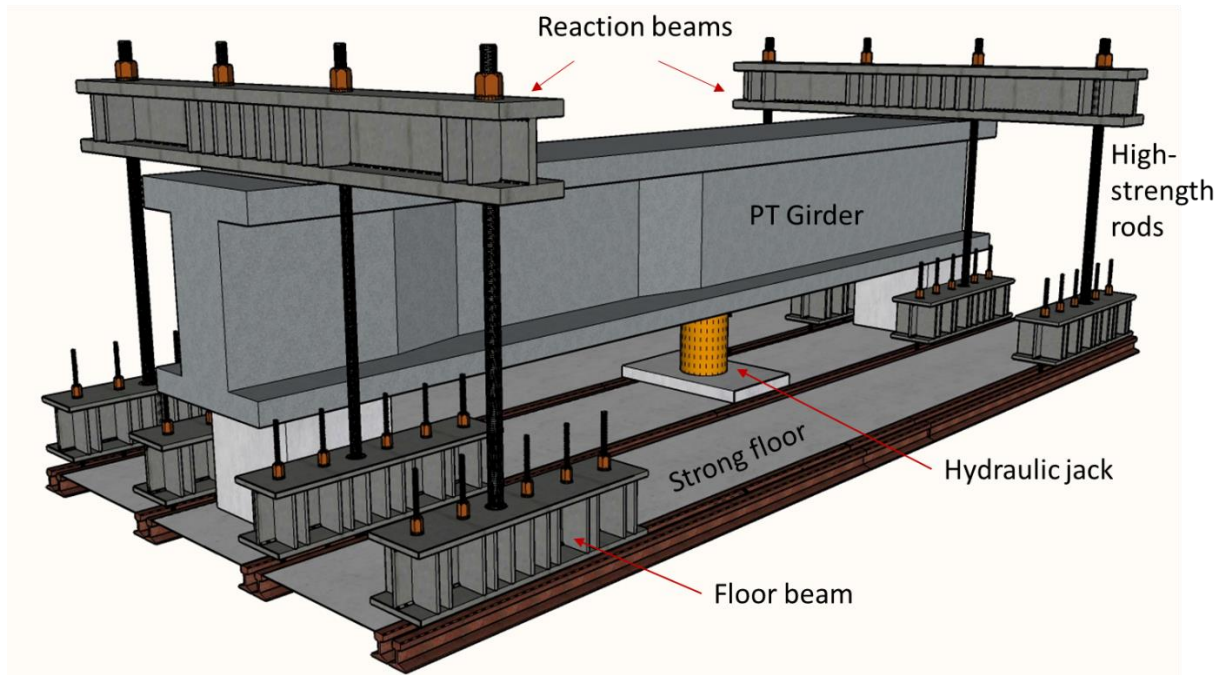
Schematic view of reaction system with specimen and loading jack
